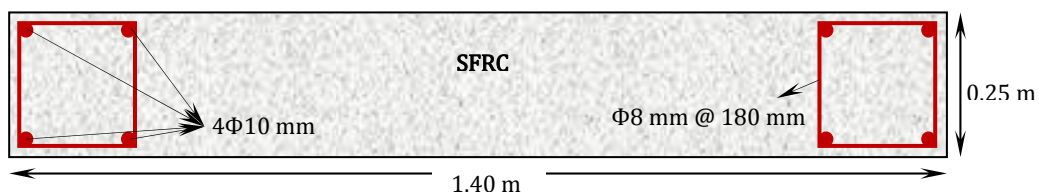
Steel stirrups used for the RC-SFRC precast segment.
